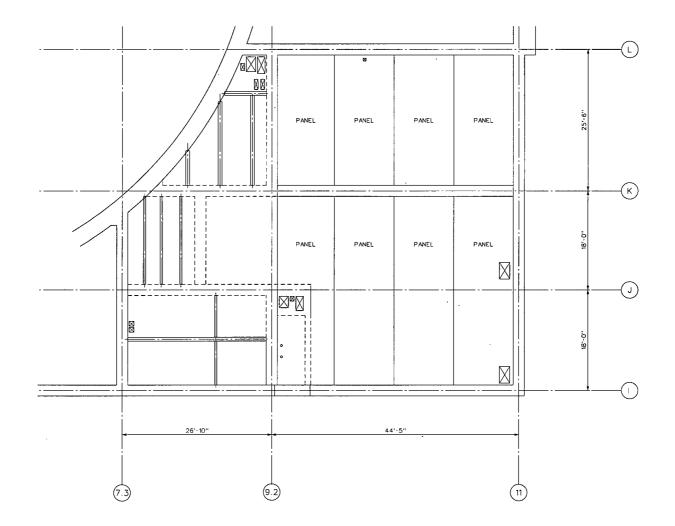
Auxiliary Building Finned Floor (Sheet 1 of 3)
